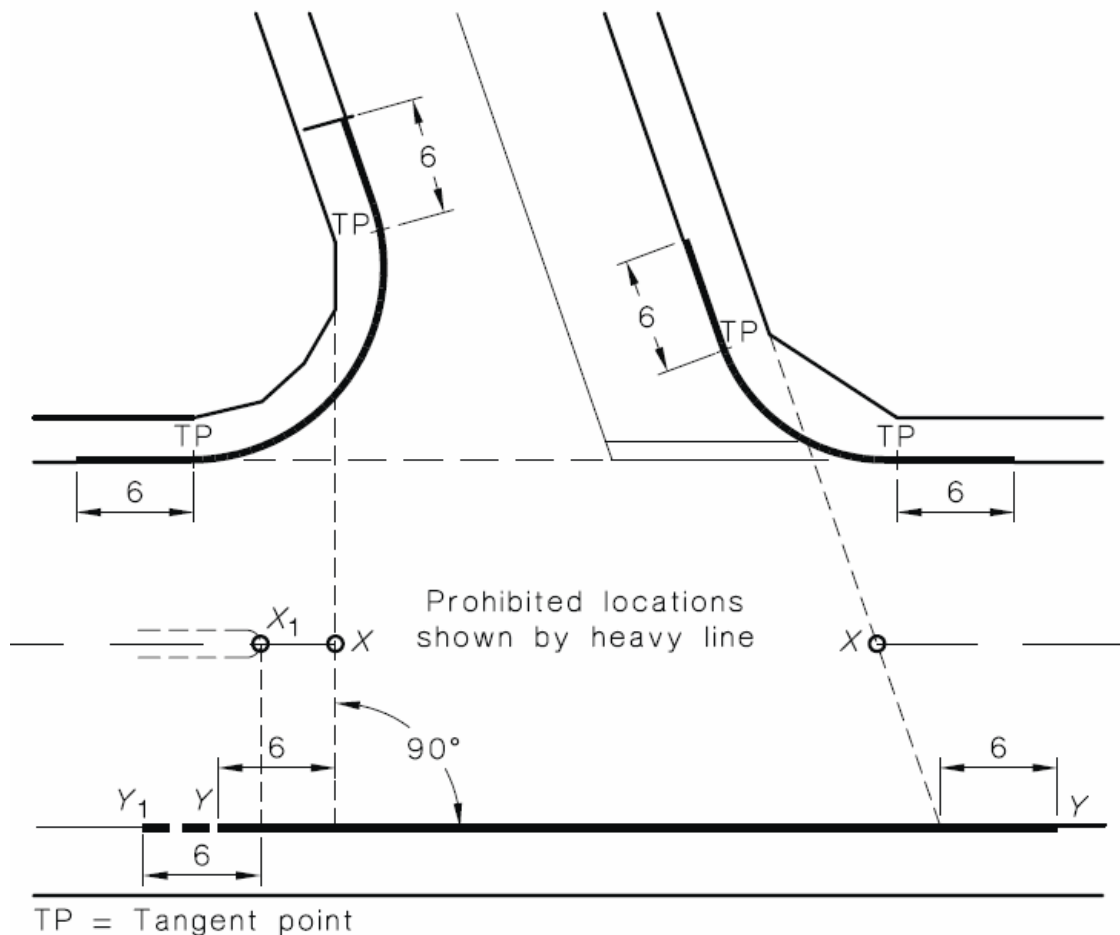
Figure source: AS2890.1:2004 – Parking facilities – Off-street car parking, Figure 3.1
